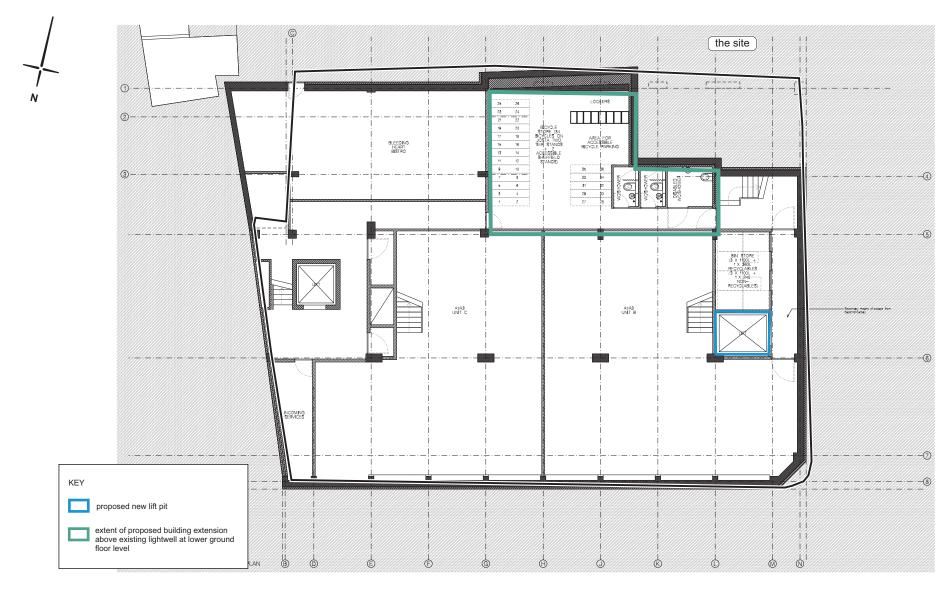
Plan of proposed alterations to the existing lower ground floor, showing the location of the proposed new lift pit (Groupwork, dwg. no. 248–500, rev. K, date December 2017)
